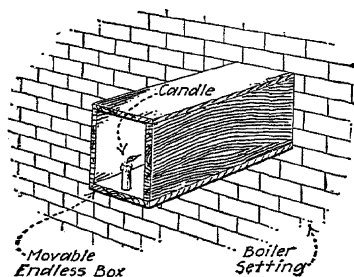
Lighted candle used for locating air leak into a boiler setting. The box (which is open at both ends) is used around the candle to protect it from side drafts.
